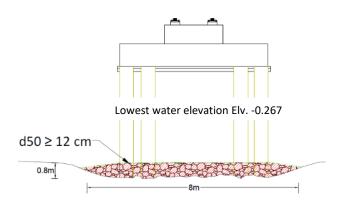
Side view of planned riprap design on Kuala Samboja bridge.
